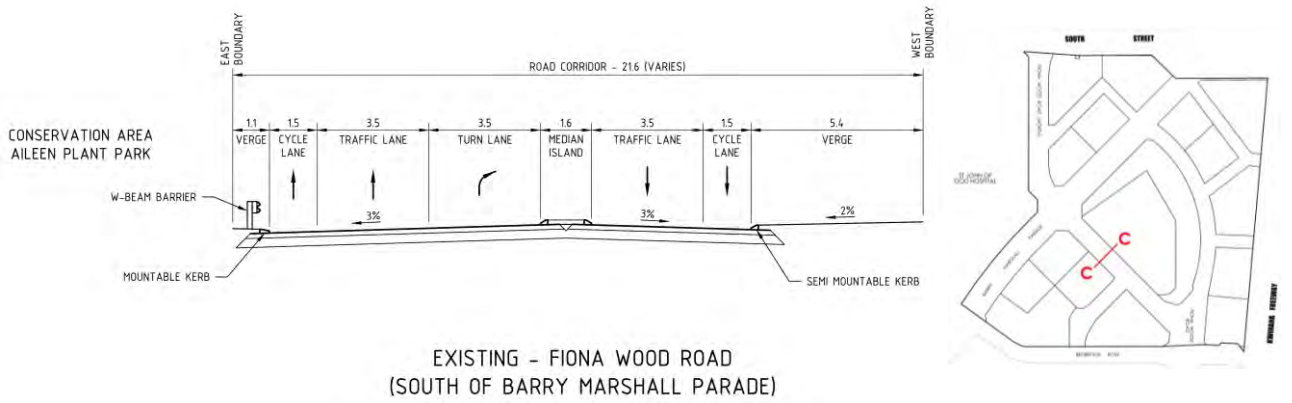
Section C-C Fiona Wood Road (South of Barry Marshall Parade)
